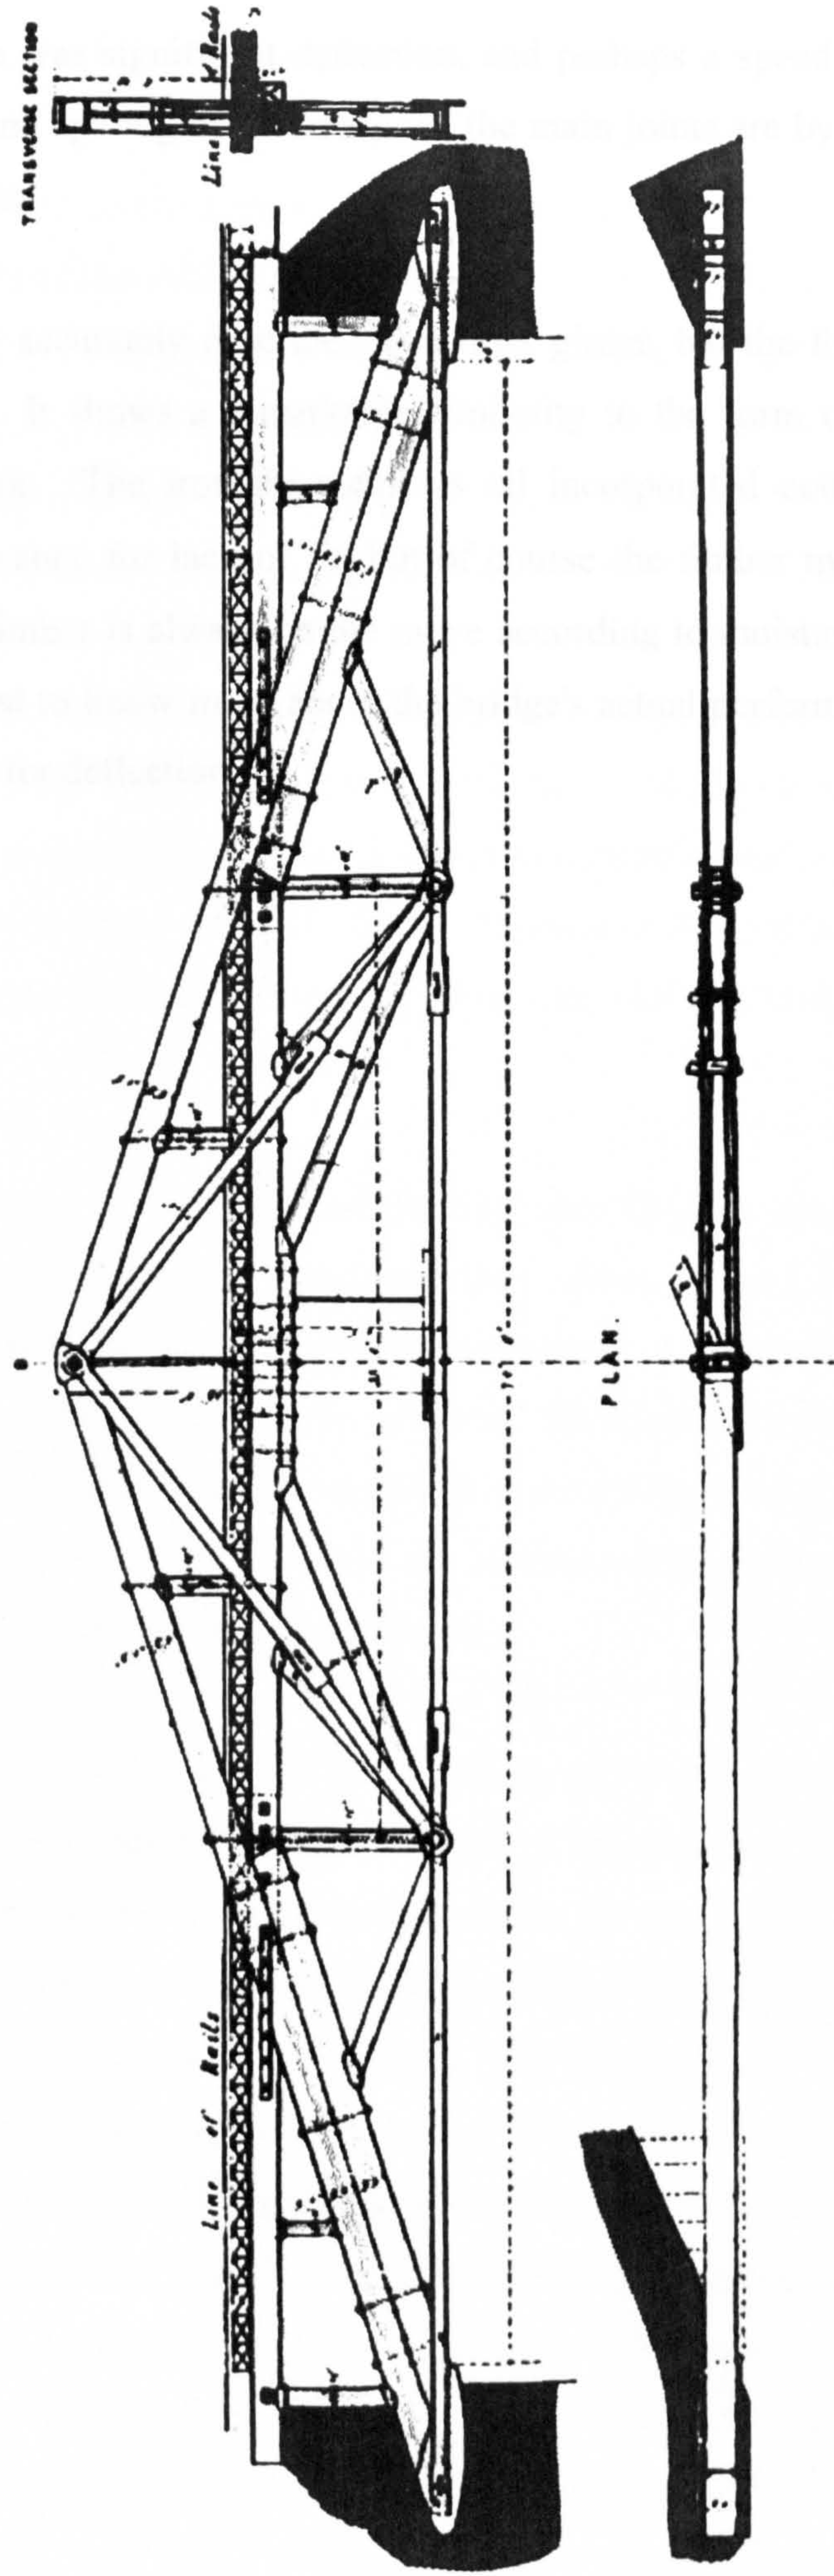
Brunel timber/iron truss, span 75 ft. c. 1840.
